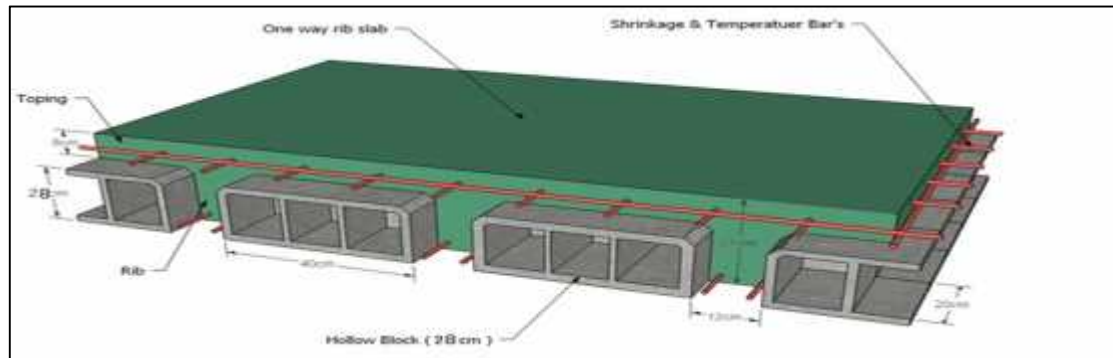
Detailing One Way Rib Slab ( Rib3(28)).
